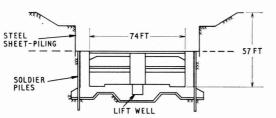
CROSS-SECTION OF STATION EXCAVATION NORTH-SOUTH
